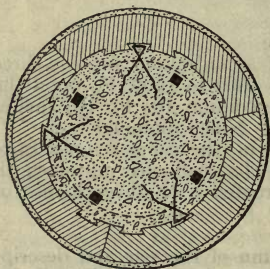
Terra-Cotta Casing for Reinforced Concrete Column.
